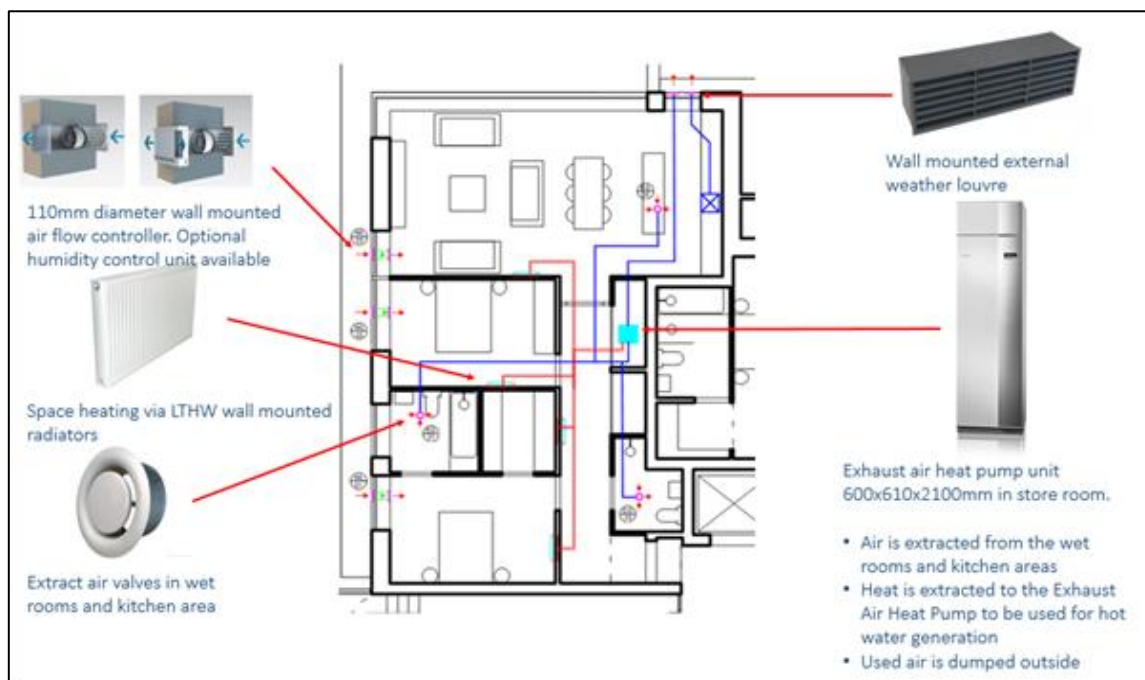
Example Diagram of Typical Exhaust Air Heat Pump Layout
